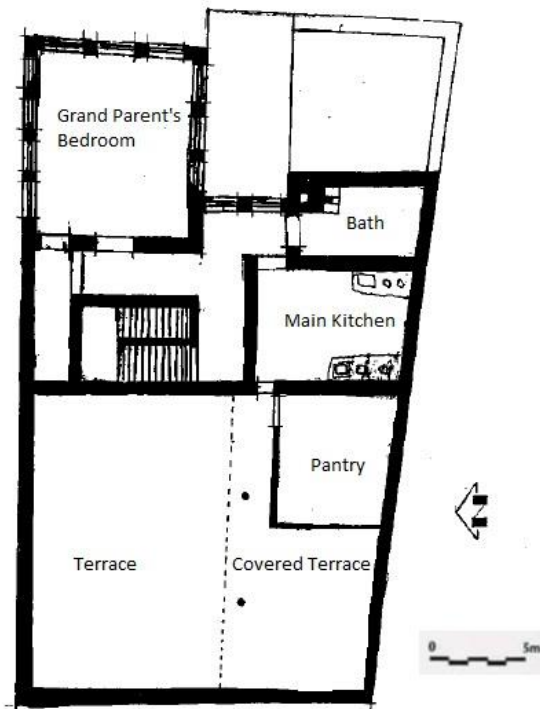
Bamansur House (Fourth Floor) Mukalla (Al-Maashi, 1998)
